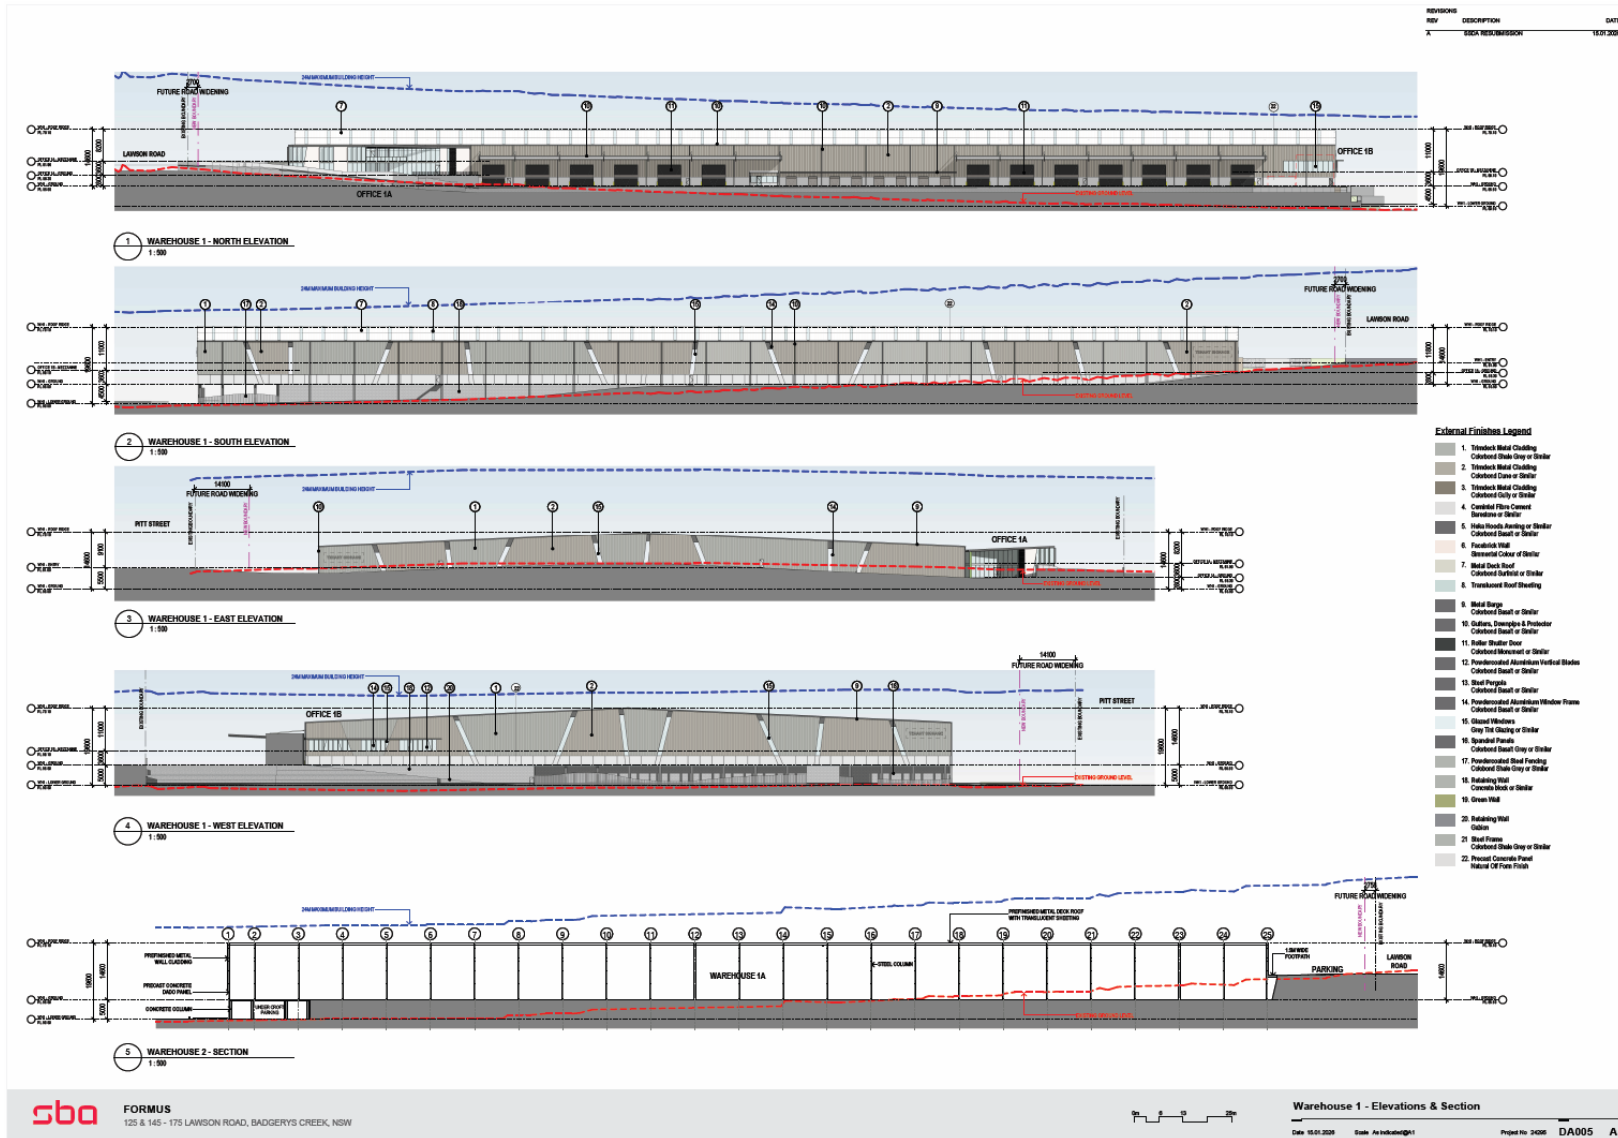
Extract of proposed architectural drawings, showing elevations of Warehouse 1.
